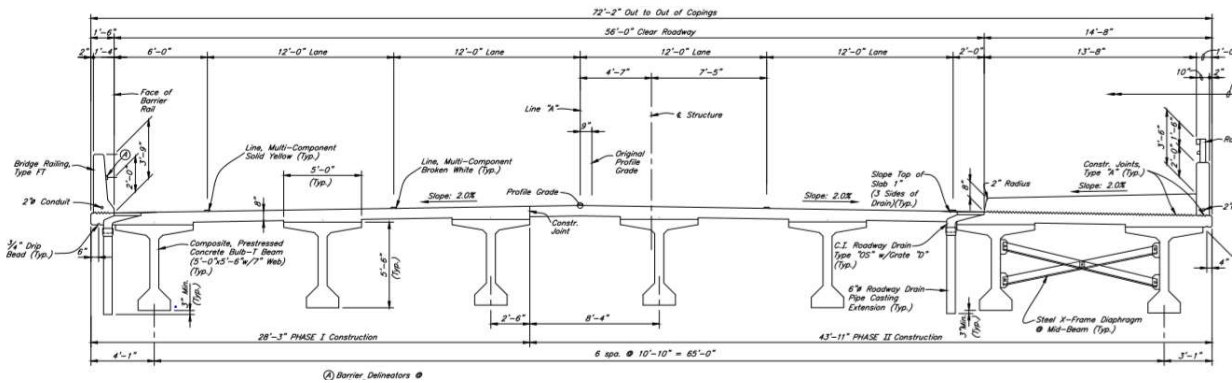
Typical Section of the Bridge (NBI 18790) (2014)
